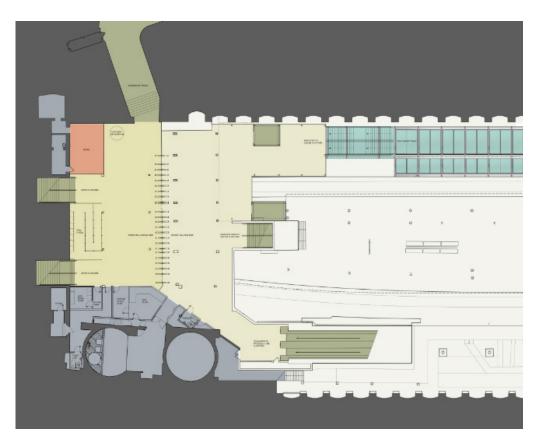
Plan of proposed Station Capacity Upgrade works to the ticket hall and District & Circle platforms
